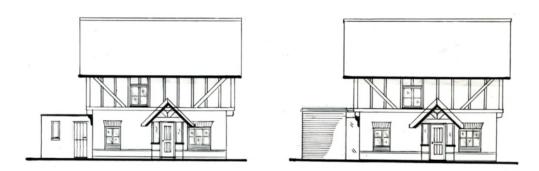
Existing and proposed elevations (south-west) - 2023 scheme
